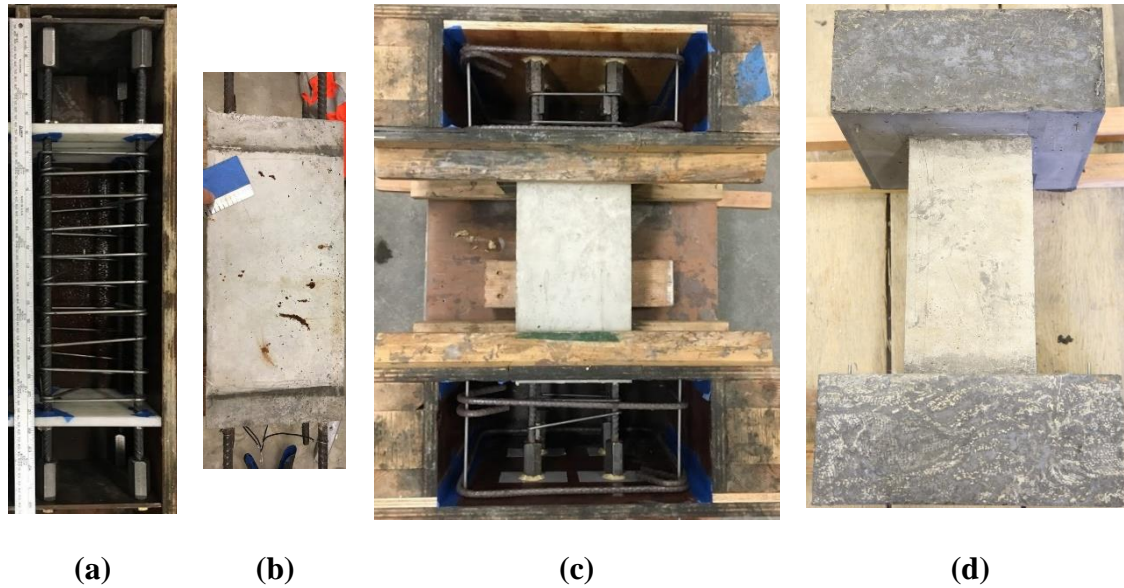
2: Construction progression for typical experimental specimen: (a) Column reinforcement prior to casting, (b) column element after casting, (c) column element in endcap formwork, (d) final experimental specimen.
